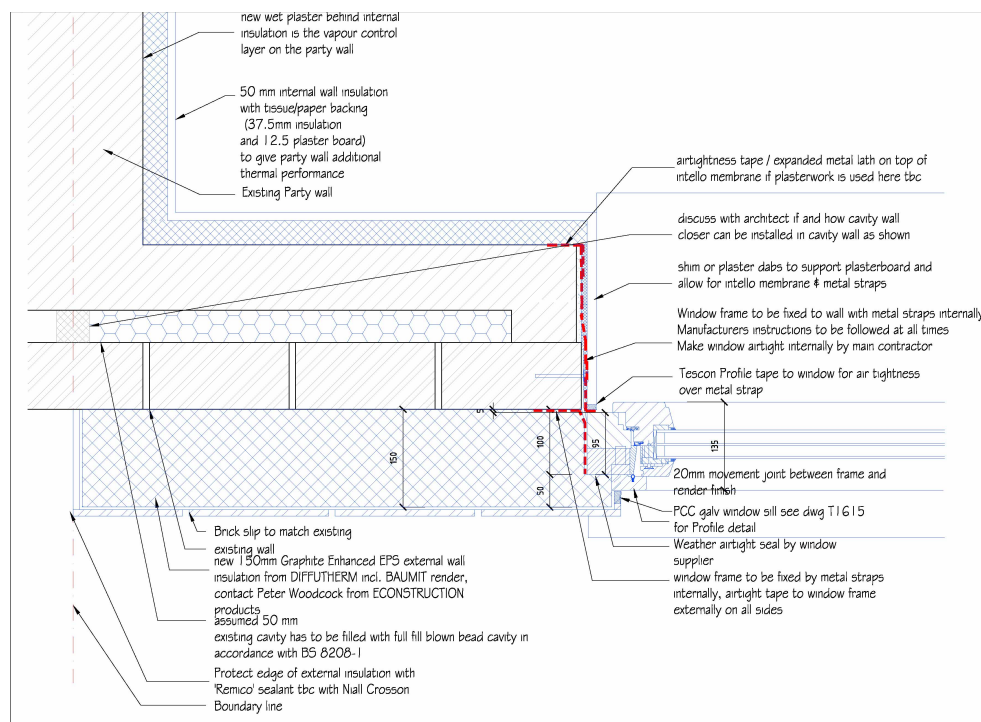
details existing wall insulated externally, cavity filled, & lined with insulated plasterboard
